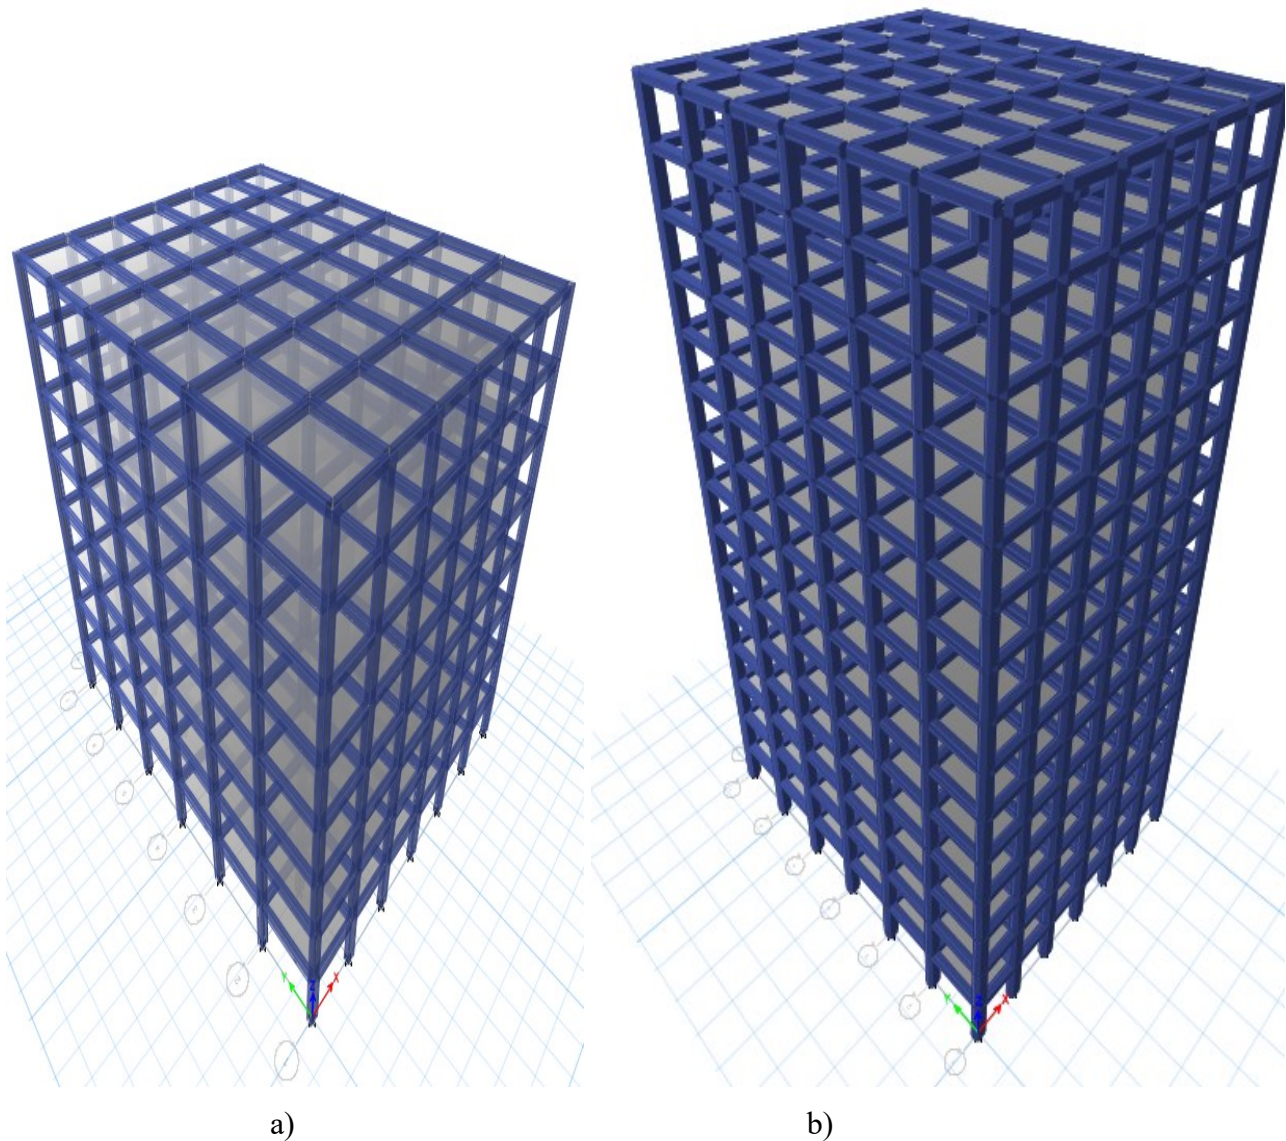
3D ETABS regular structural model of building a) story 8 and b) story 15
